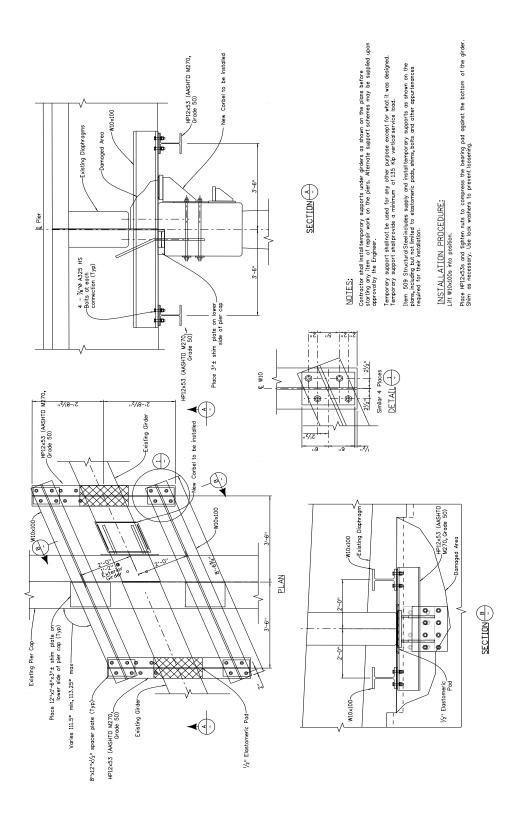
(I)-6 Sample Details of Straddle-Type Falsework
